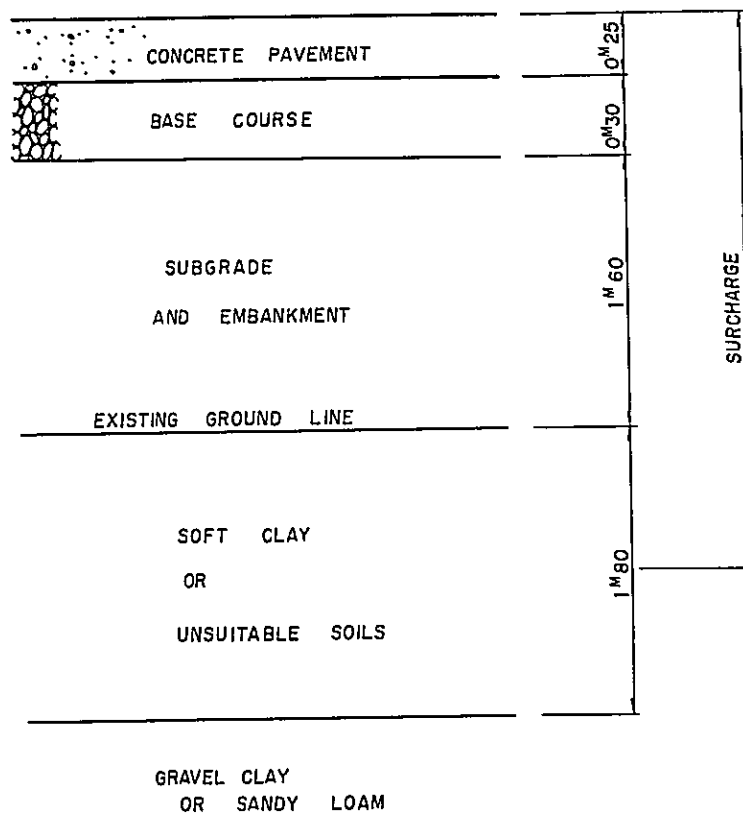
TYPICAL SECTION OF EMBANKMENT
